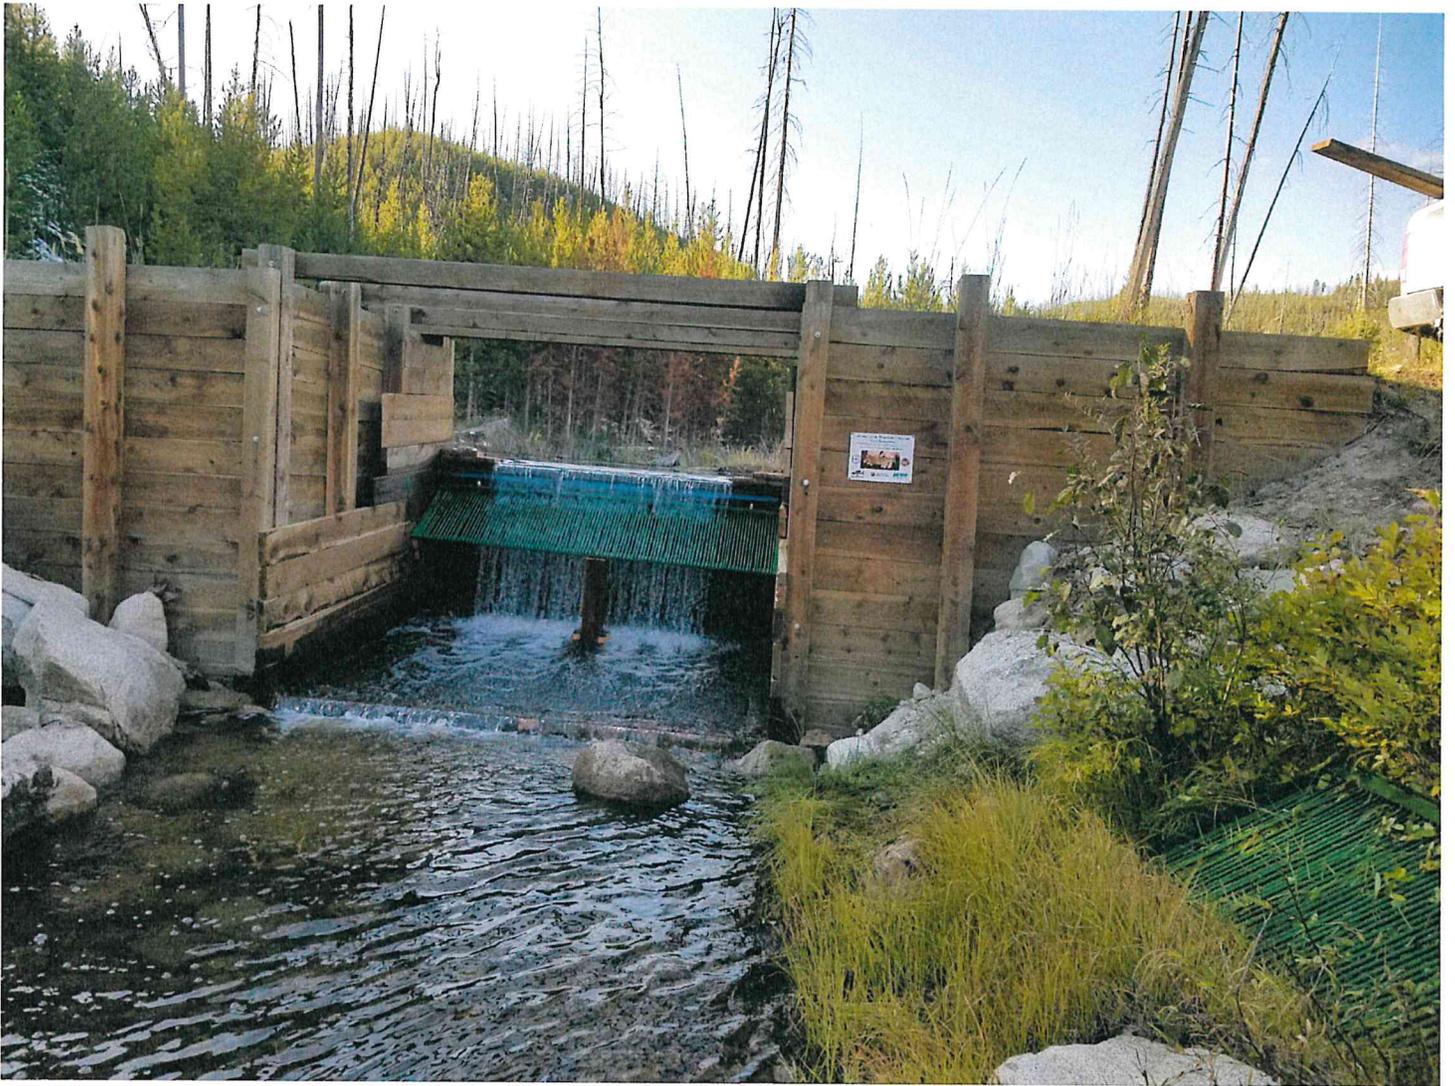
Bender Creek fish barrier constructed in 2017 which would be similar to the barrier proposed on Doolittle Creek.
